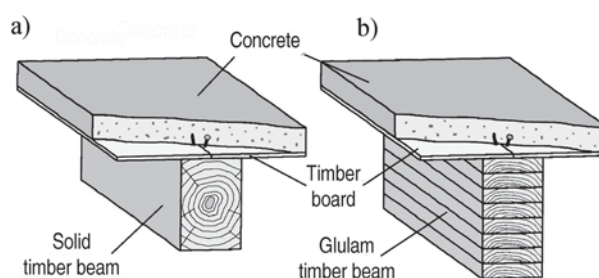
Structural solutions of TCC joisted floor with solid (a) and glulam (b) timber beams
